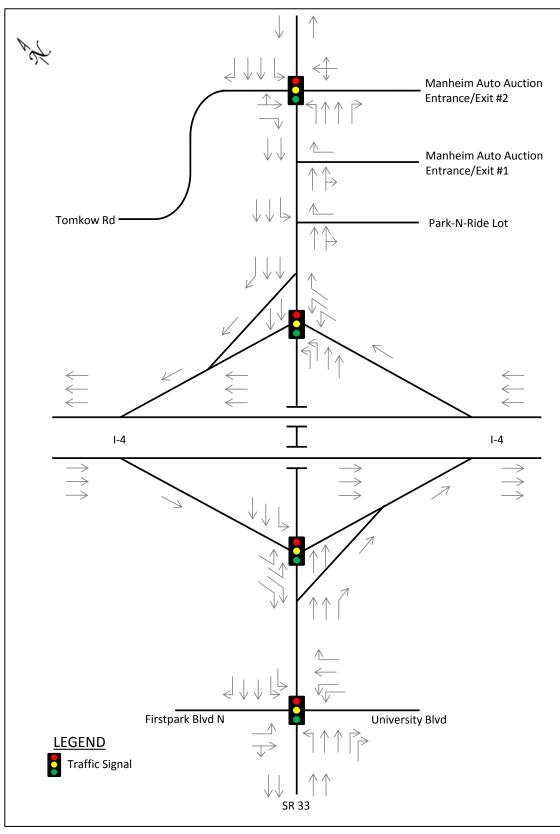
DESIGN YEAR (2036) INTERCHANGE/INTERSECTION GEOMETRY – BUILD ALTERNATIVE NO. 1
